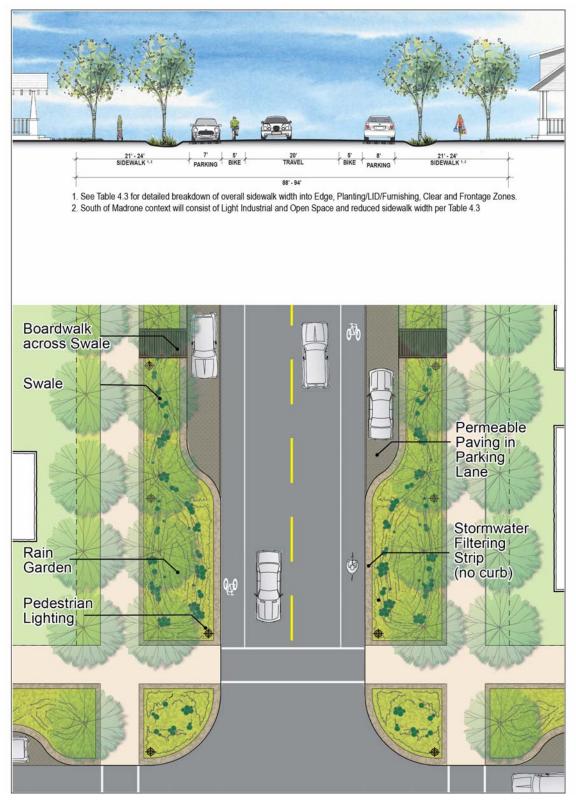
B PARKWAY STREET – BETWEEN PINE AND ALDER STREETS (BB TO CC)
